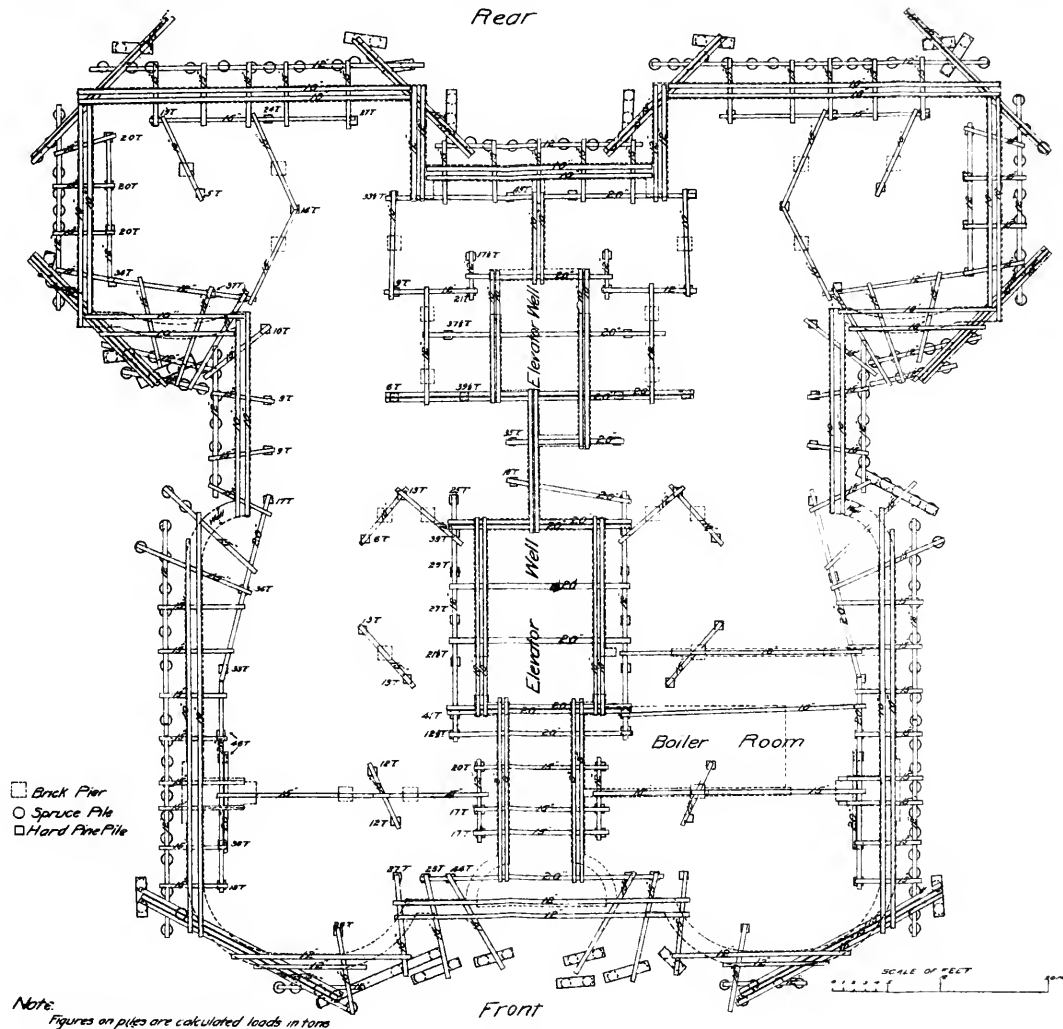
PLAN OF FOUNDATIONS OF HOTEL WOLLATON, BROOKLINE, MASS.
